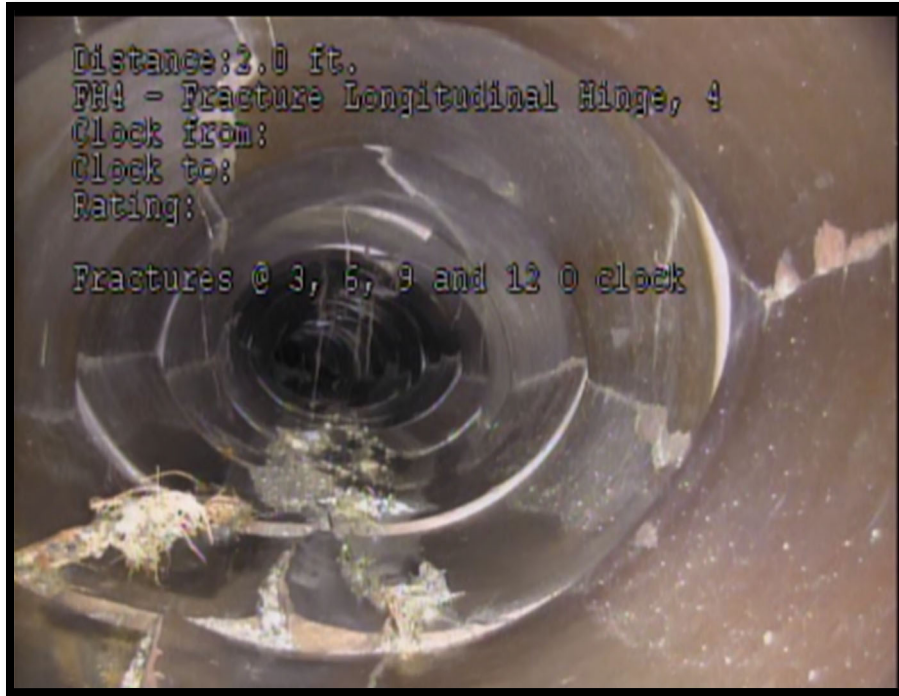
View of the pipe between manhole G10ST23656 and 5743. Showing plant roots growing into the pipe, multiple fractures, and pipe deformation.
